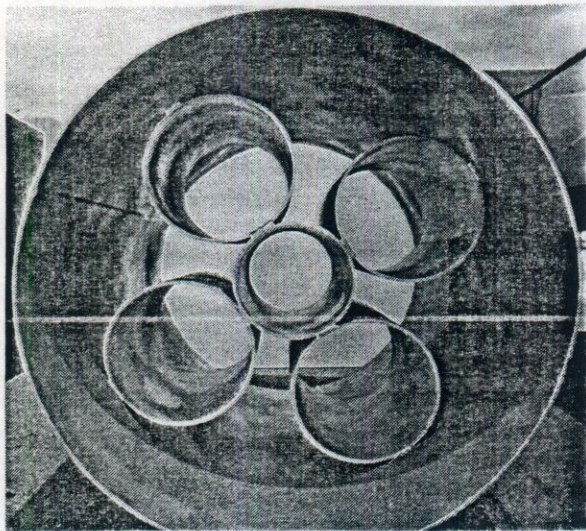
Sewer, Culvert, and Drain Upgrades
